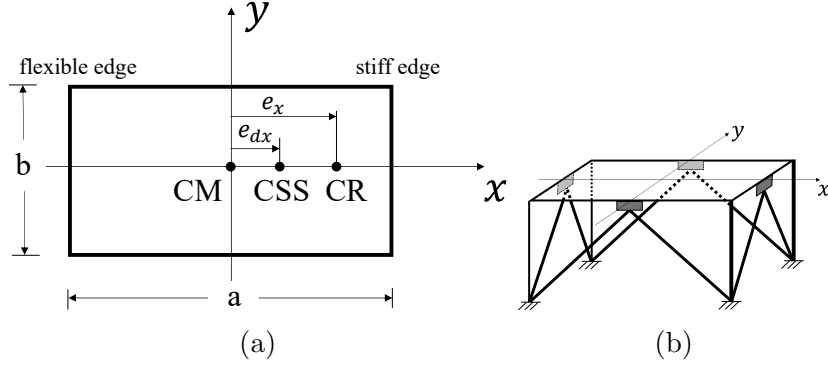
Plan and elevation view of one-way asymmetric structure with SRSs installed.
